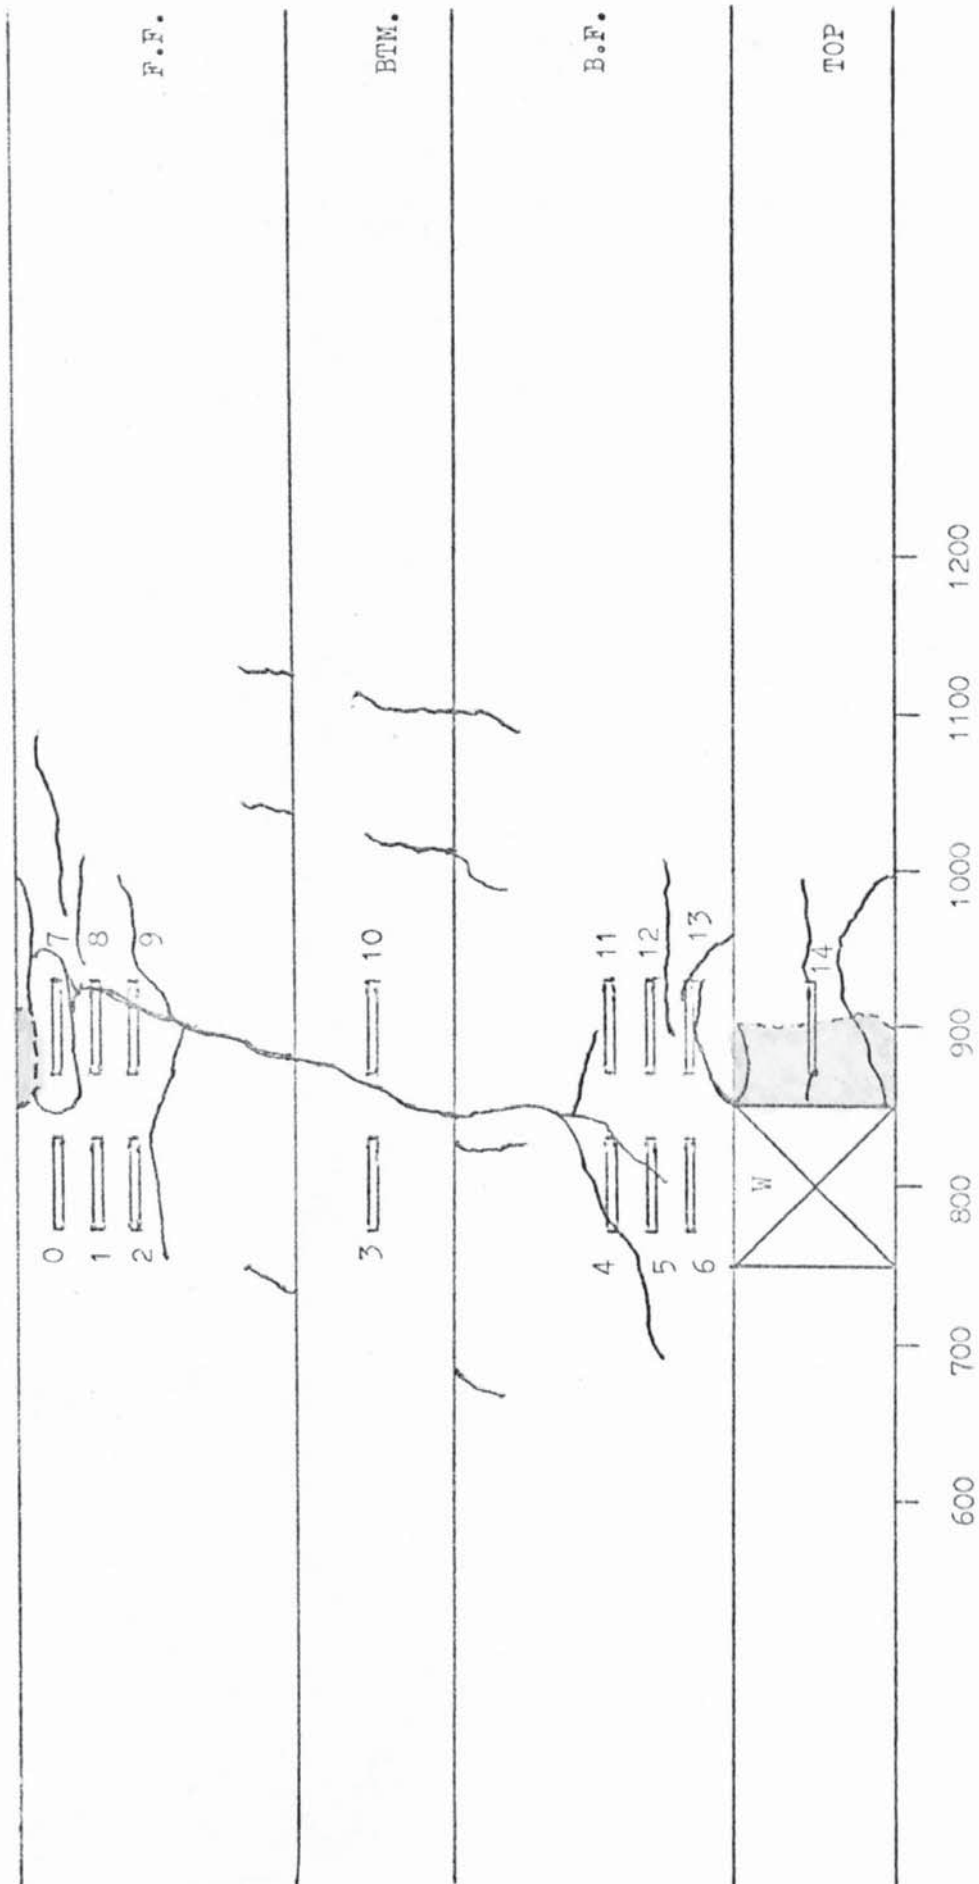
FAILURE CRACK PATTERNS - BEAM 36 ( MODE 1 )
